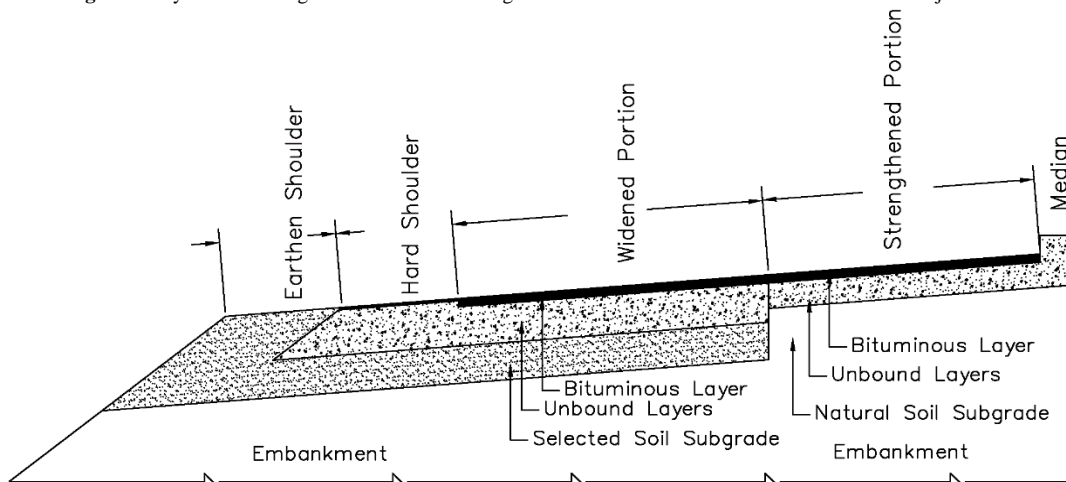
Half Cross Section of Pavement Showing Strengthened and Widened Potions of Road
